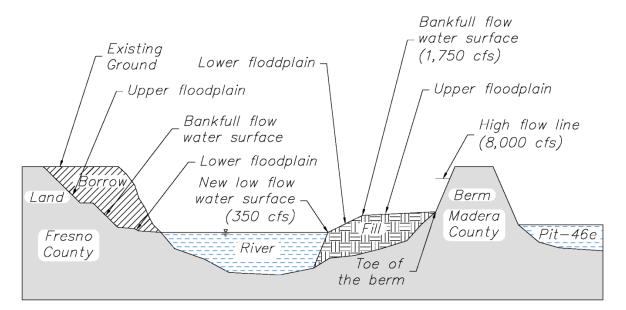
Conceptual Floodplain Diagram (looking downstream)
